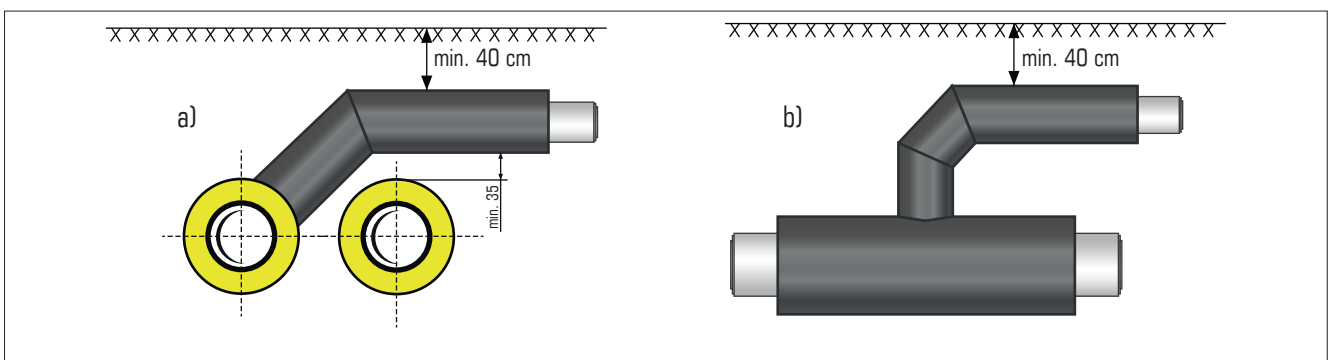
Minimum thickness of a branch pipe covering layer a) perpendicular branch pipe b) parallel branch pipe
